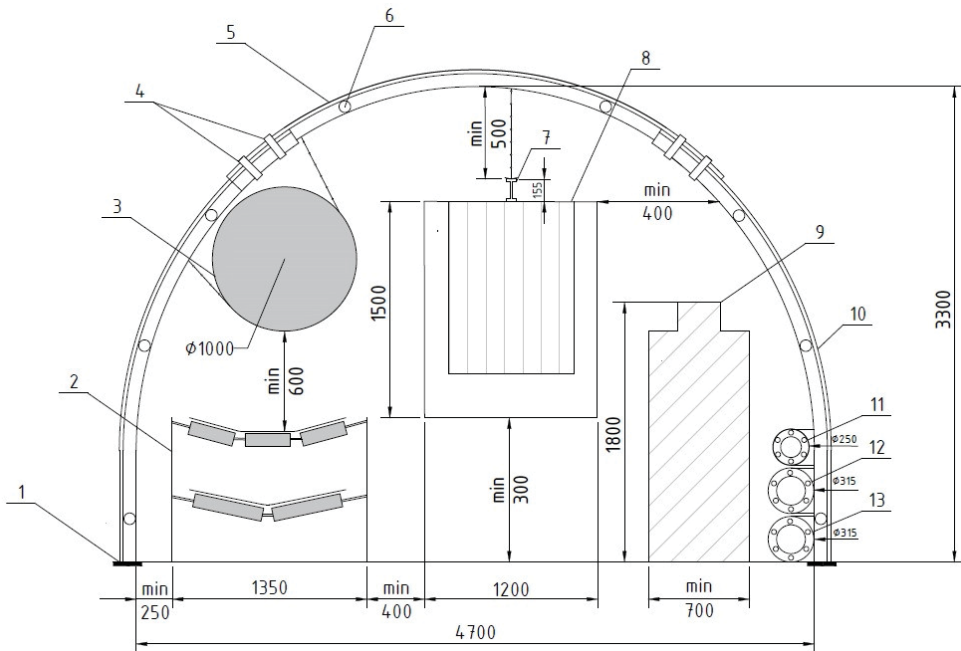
Cross-section of the roadway II: 1—support foot; 2—belt conveyor GWAREK-1000; 3—duct; 4—double yoke stirrups; 5—roof arch of the yielding support LP8/V29/A; 6—multi-element strut; 7—rail of suspended monorail; 8—BIZON 120-X suspended monorail; 9—passage for miners; 10—sidewall arch; 11—compressed air pipeline; 12—drainage pipeline; 13—fire pipeline.
